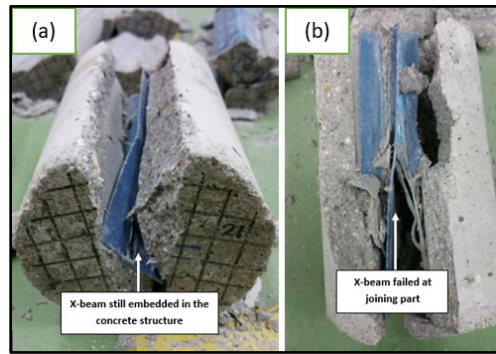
Fracture mode of concrete containing X-shaped reinforcing structure
